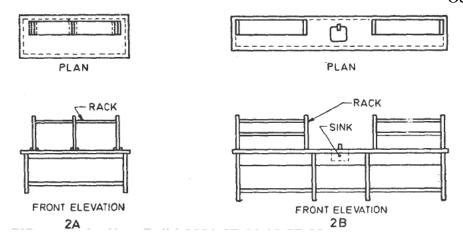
TYPICAL PLANS AND ELEVATIONS OF ABOVE-BENCH FITTINGS
